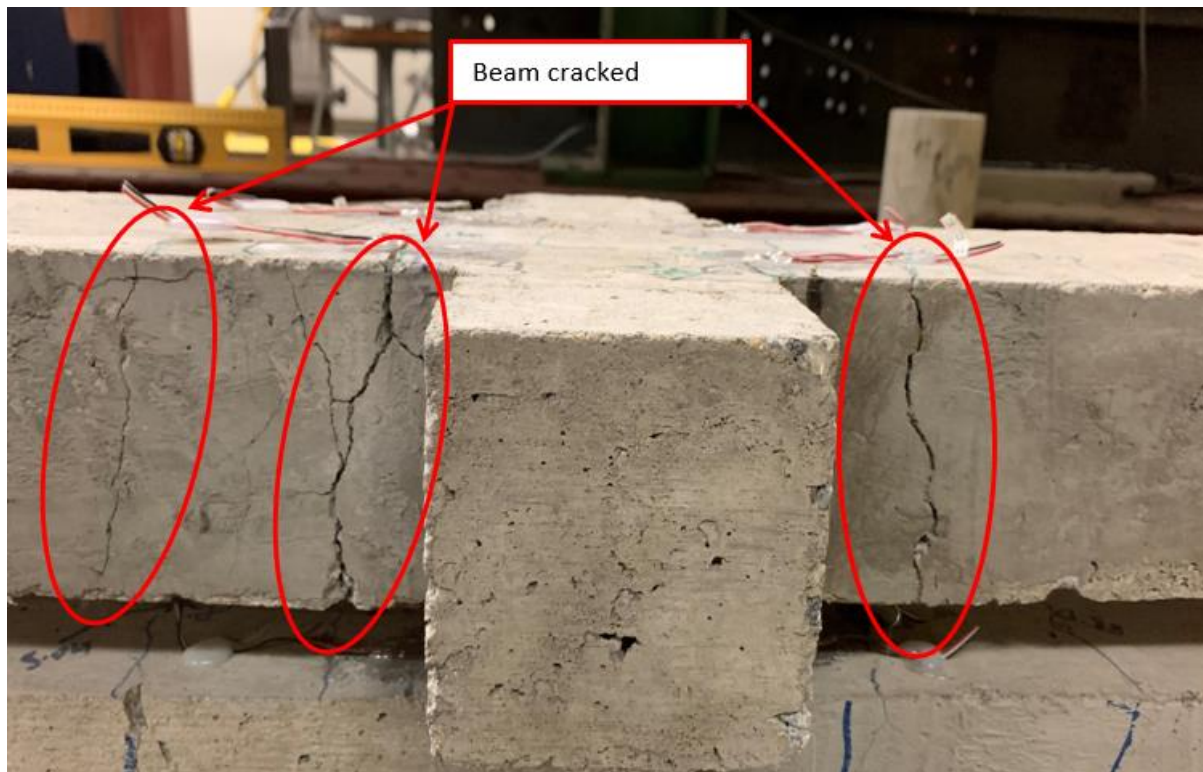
Underneath Crack Pattern in the Missing Column for Sub-assembly S2-2
